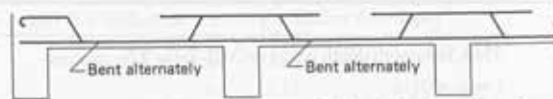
One possible arrangement of slab reinforcement. Note: Most designers use only straight bars because of economics.
